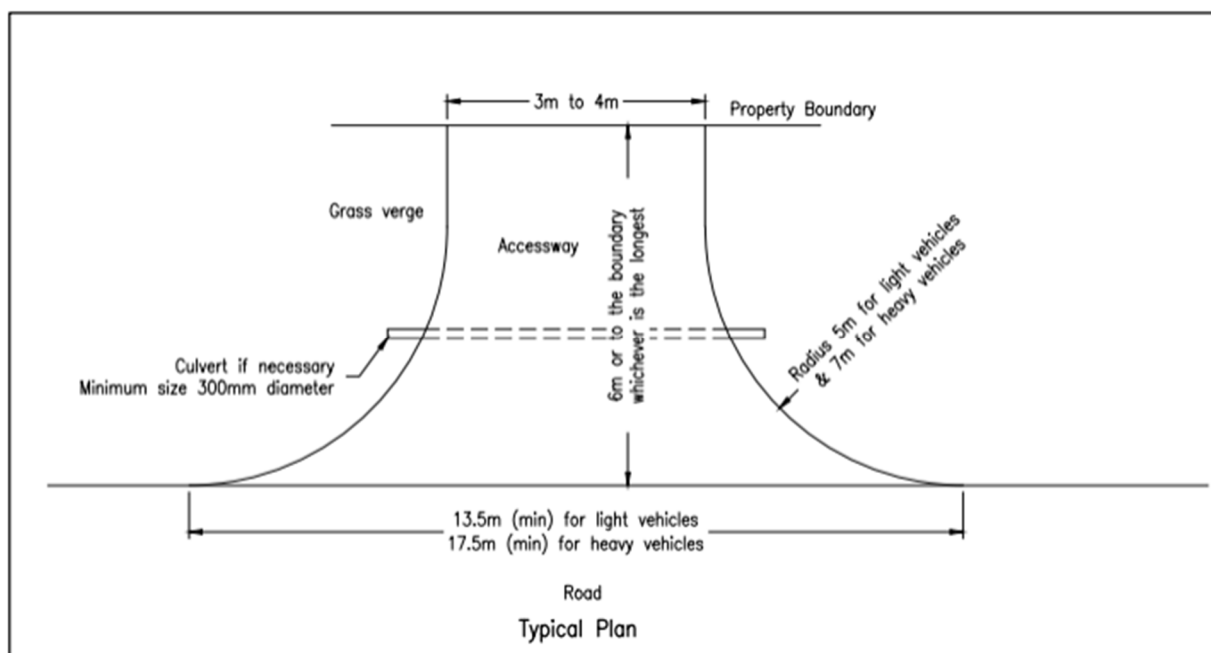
Indicative Symonds Construction Yard Site Entrance(HDC Development Engineering Standard R18)
